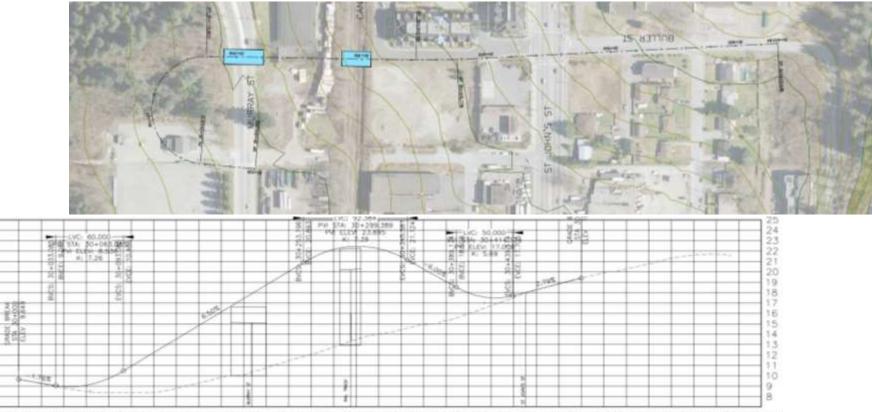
Potential Buller Street Overpass Horizontal and Vertical Alignment
